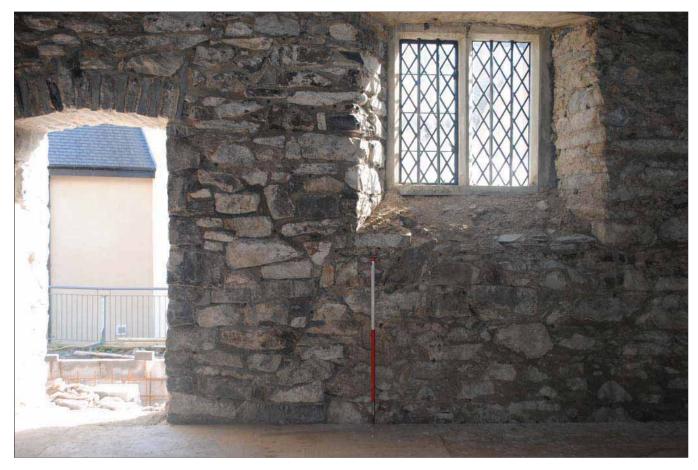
Old Grammar School internal - Modern Stonework by the Cross-Passage Doorway on the West Facing Internal elevation
